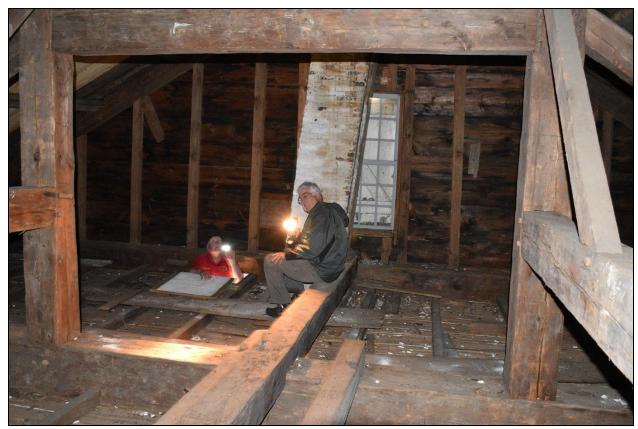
West gable end of New Hampton Town House (note that the chimney was constructed on an angle)
